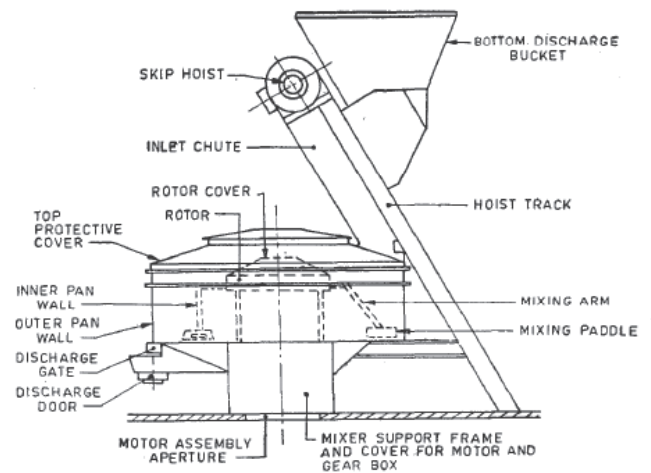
TYPICAL PAN TYPE CONCRETE MIXER
